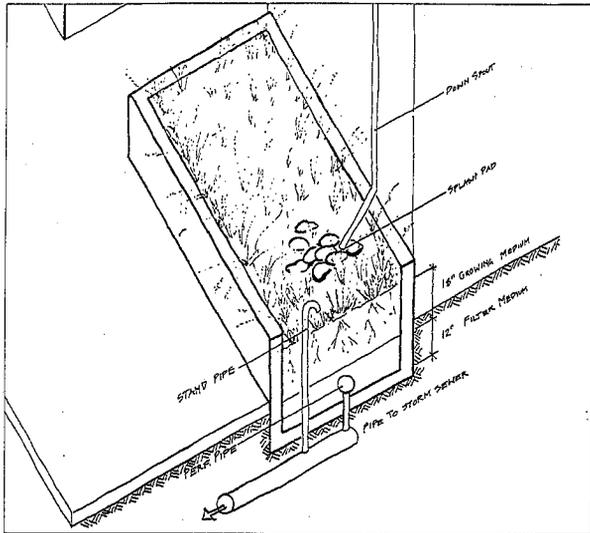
Bio-retention planters can be raised (as shown above) or at-grade to create containerized rain-gardens.
